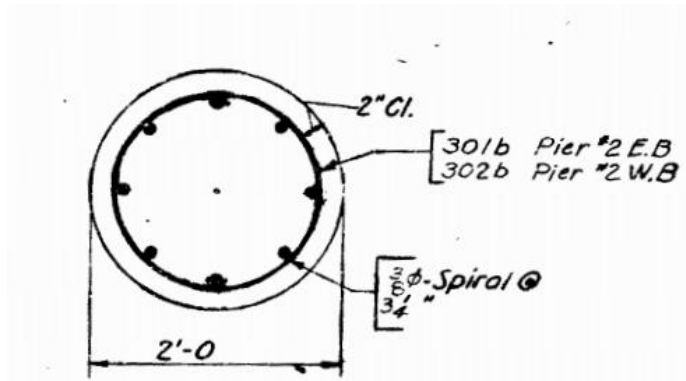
Cross-Section of Pier 2 Column for Structure I64-07-02367 BEBL (NBI 33280) (INDOT, 1964)
